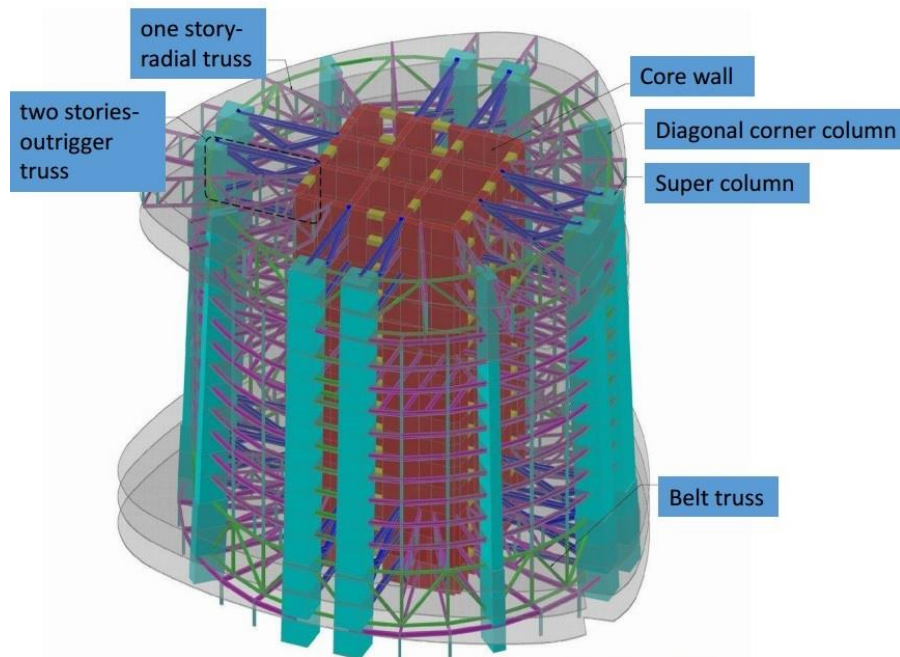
Shanghai Tower structure in detail (Nichols, 2014)
